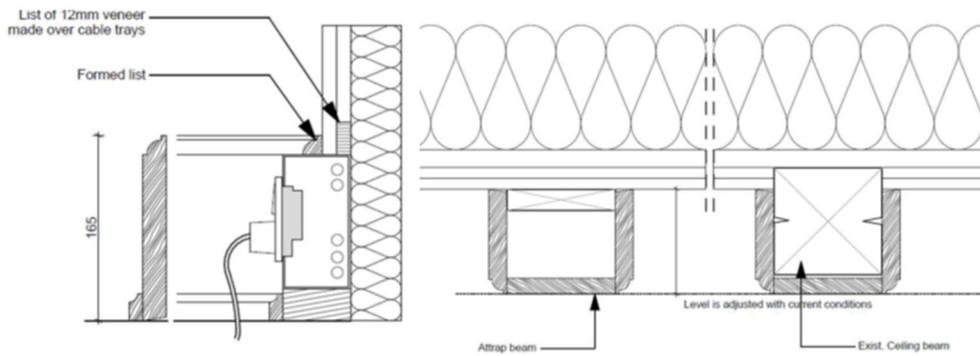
Sockets and other technical outlets and substitution beam. Drawings with permission from ISAGER Architects, Odense, Denmark
